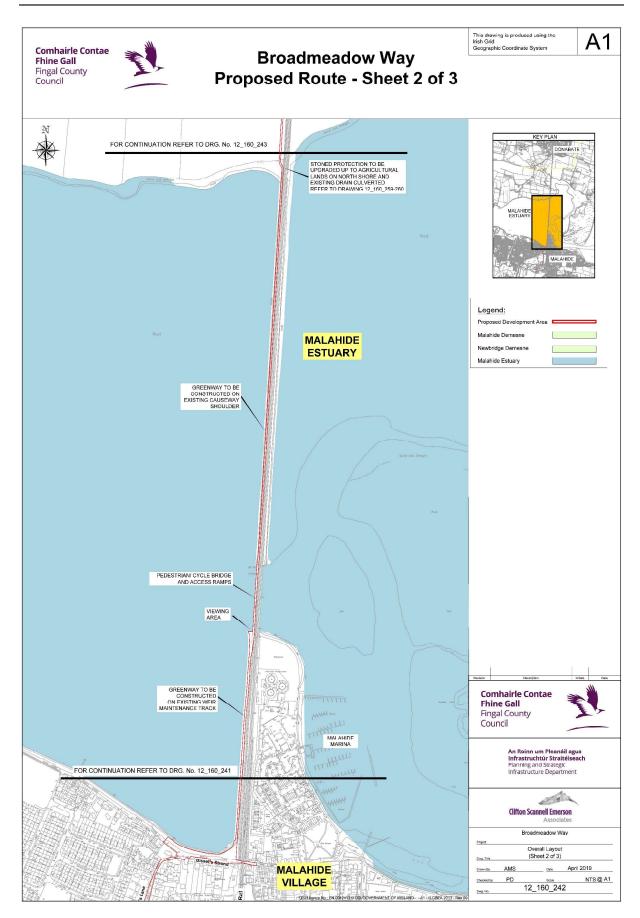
Site Location and General Site Setting - Sheet 2 of 3.
